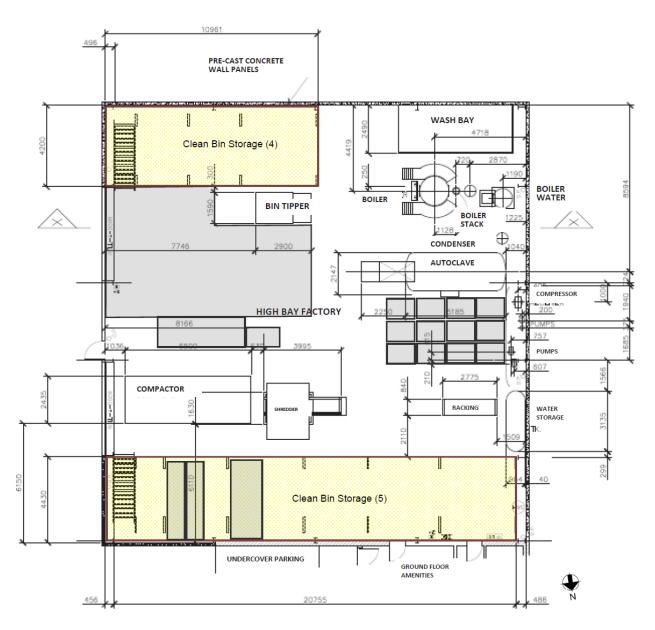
9 Kenoma Place, Arndell Park Site Plan
